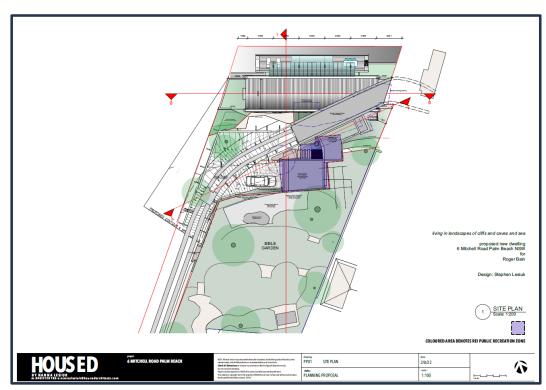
Concept Site Plan with the RE1 zoned portion of the site highlighted in purple (Souce: Housed Architects)
